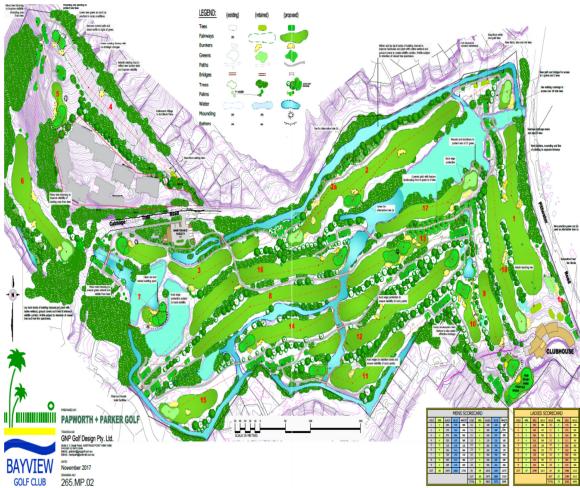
Golf course upgrade works plan (Source: Adapted by the author from Plan 'DA1.02.04 - Revision A', prepared by Marchese Partners)
